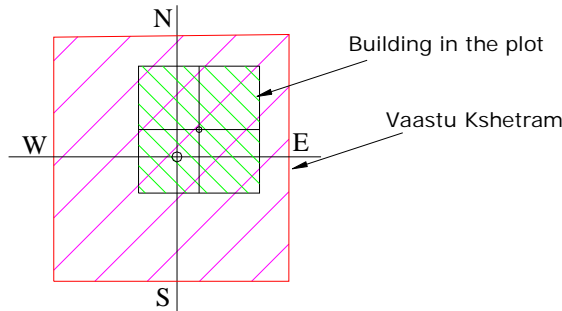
The Building is placed on the NE (Isana) segment of the plot. (Building can face either South or West)
